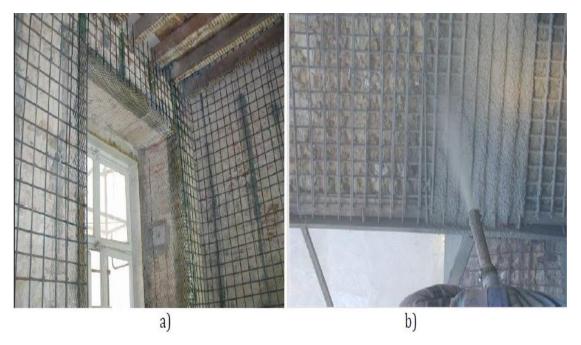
a) Masonry wall from the inside with steel mesh, b) spraying of the cement grout into the wall
